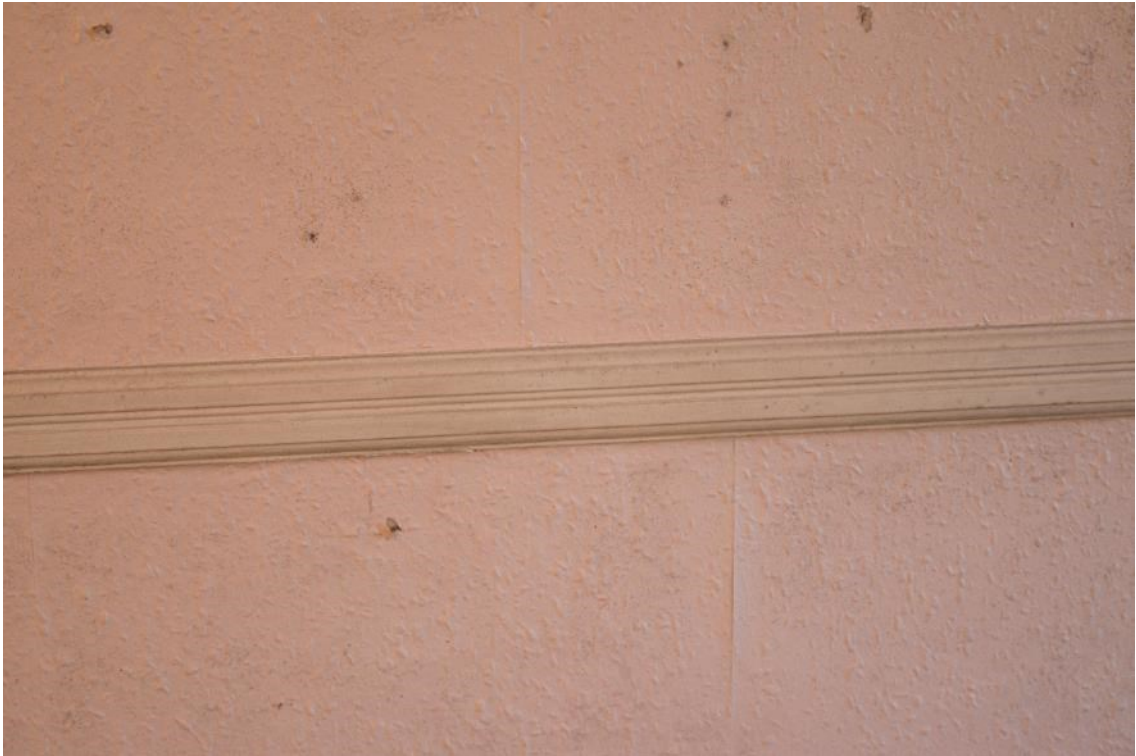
Dado rail to room 45, facing south-east (1796\_305.TIF)
